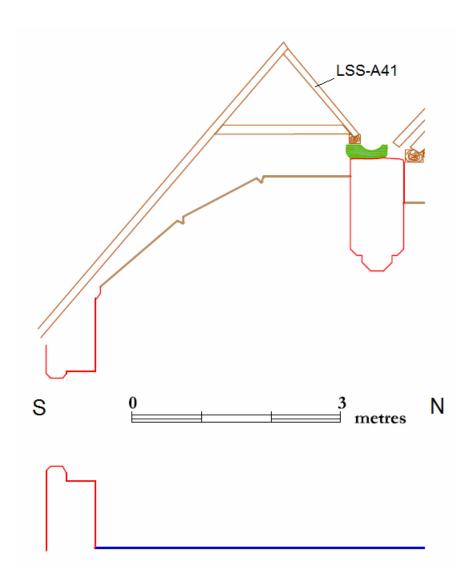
South aisle; frame 14, showing the location of sample LSS-A41 (John Crook)
